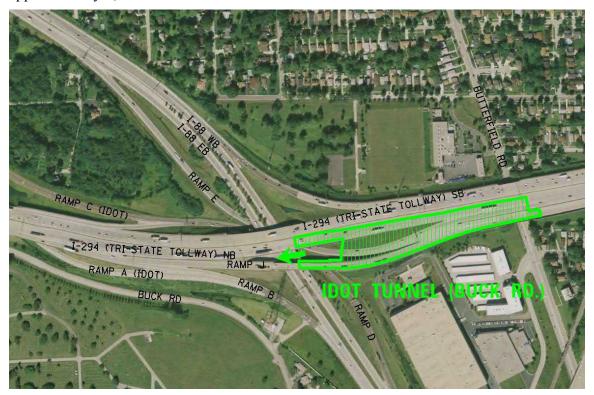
IDOT Tunnel (Buck Road) Drainage Area
